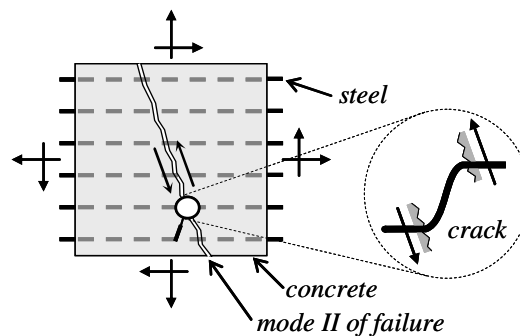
Sketch of the dowel action on a cracked member of reinforced concrete in mode II of fracture.
